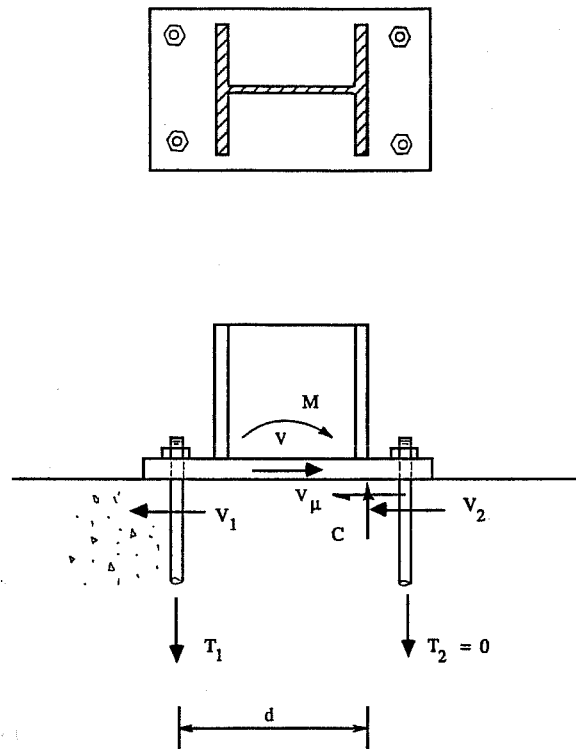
Possible Forces on Multiple-Anchor Connections with One Row of Anchors in the Tension Zone
